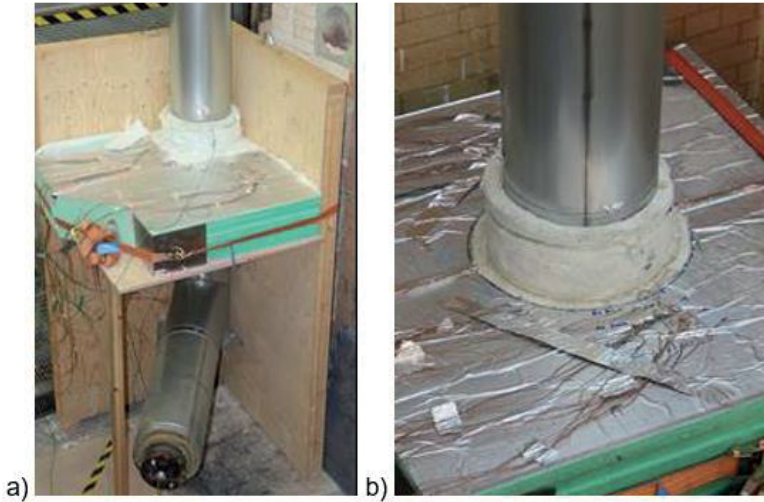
Test arrangement of metal chimneys: a) corner installation, b) axial-symmetric installation.
